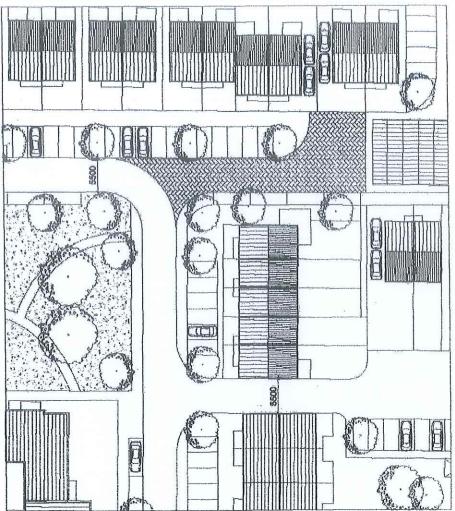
Example of on-street and on-curtilage perpendicular parking in a residential context
